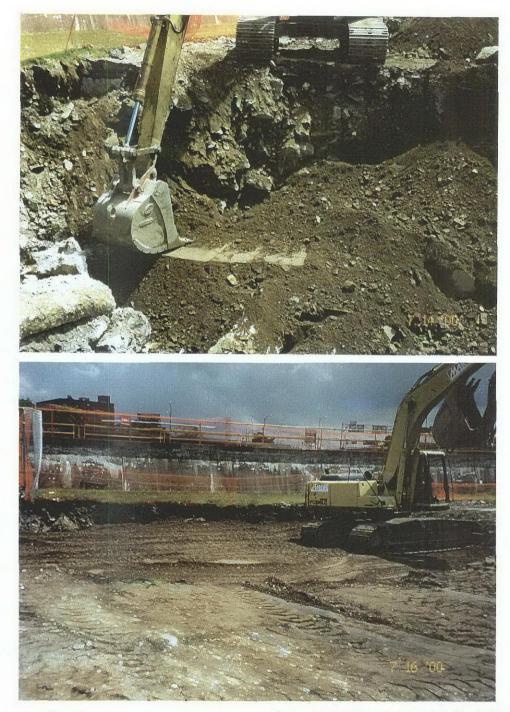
CONCRETE SLAB LOCATED NORTH OF 18-INCH DISCHARGE LINE
